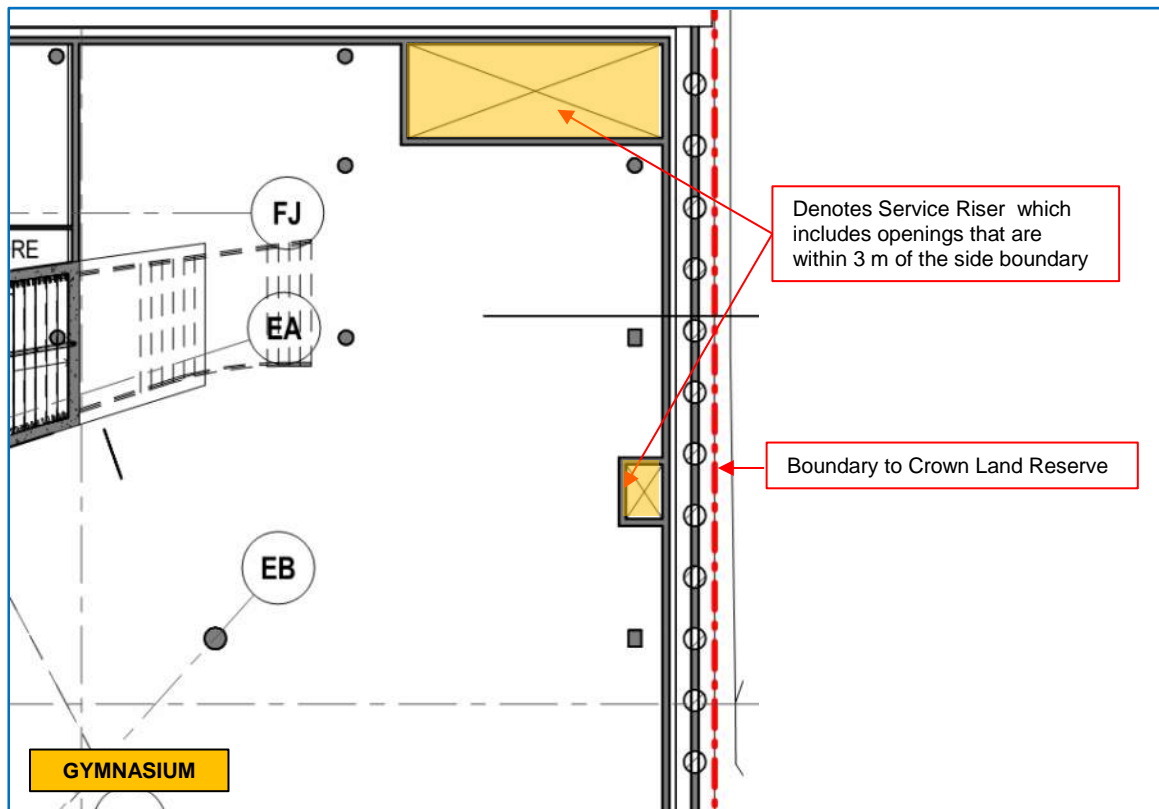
Building E (Rooftop) – service riser openings within 3 m of the adjoining boundary
